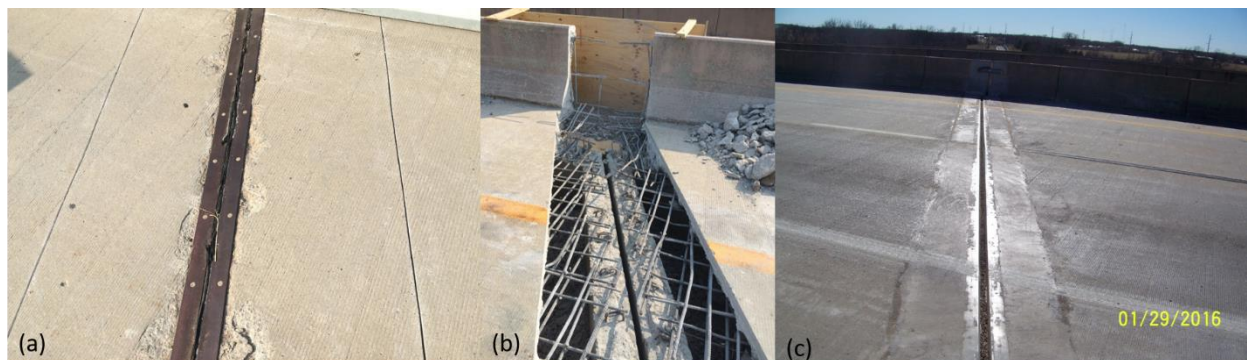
Retrofit of bridge deck expansion joint using conventional concrete (a) before retrofit, (b) after demolition, and (c) after retrofit completion
